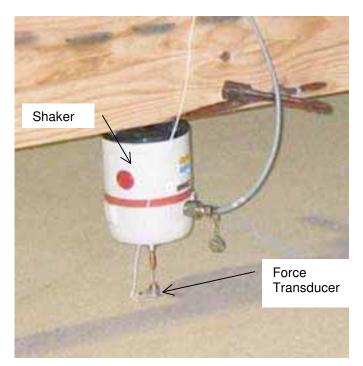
Close-up of shaker and force transducer used to vibrate the floor
